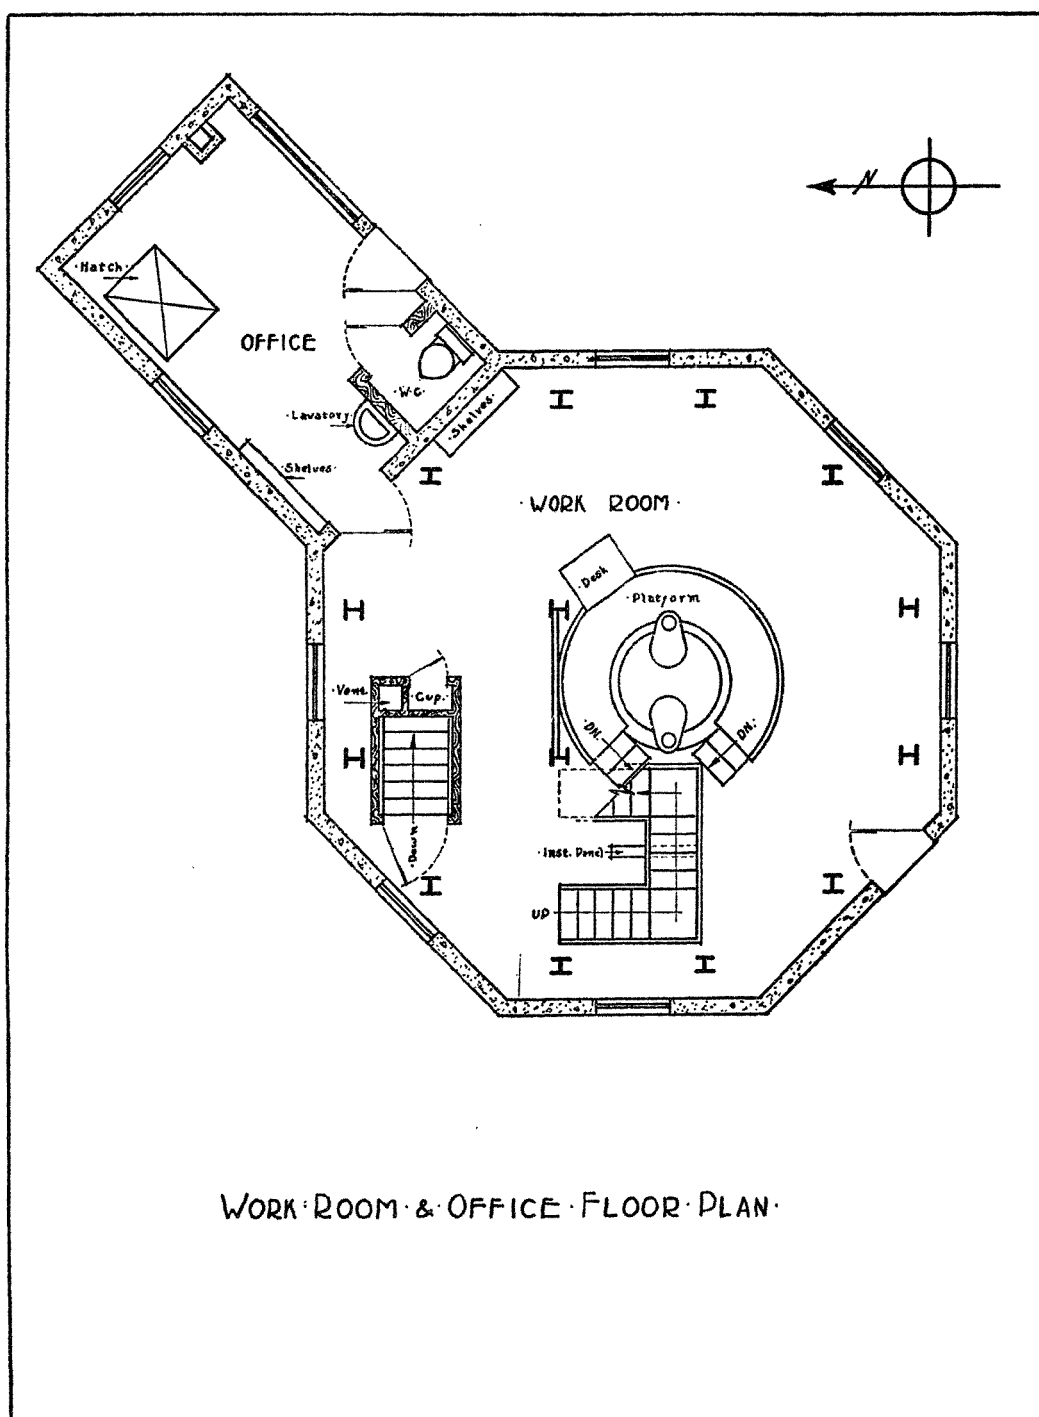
The Tower Telescope; Workroom and Office Floor Plan.
